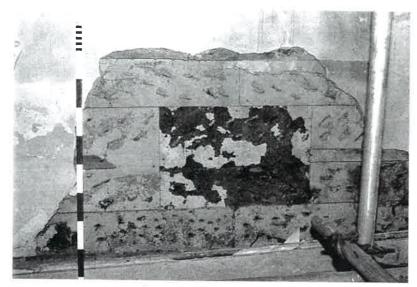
The former external (south) face of the south wall of room P showing phase I painted tarred fibreboard wall cladding revealed by the removal of butting faux-ashlar card tiles and phase VII scribed ashlar-effect plasterwork
